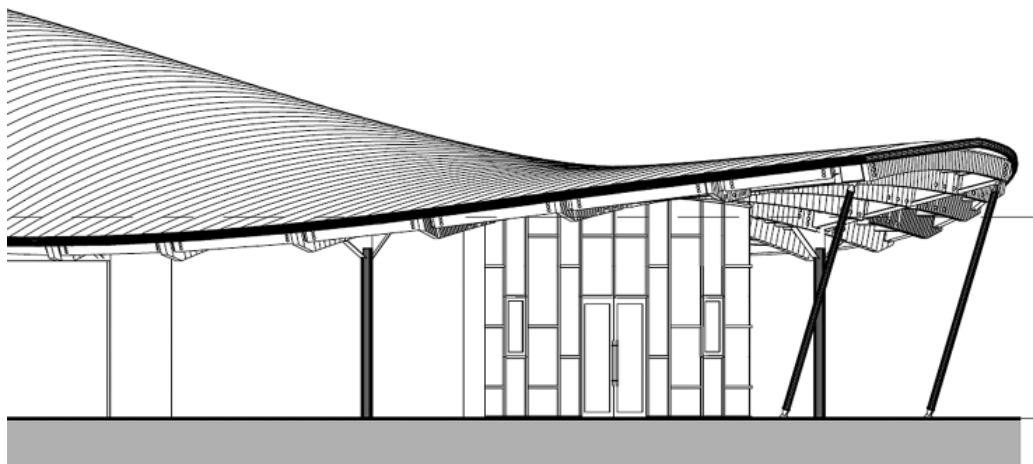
Entrance canopy. Reproduced with the kind permission of Kier Construction.
